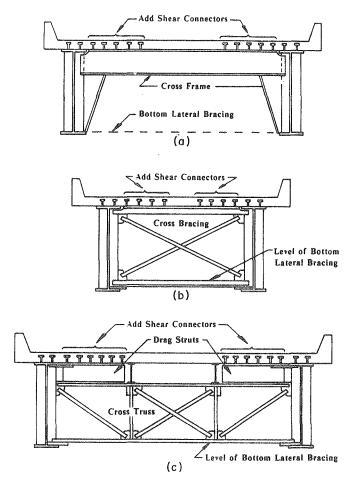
Alternative ways of providing composite connection between the deck and diaphragms.
